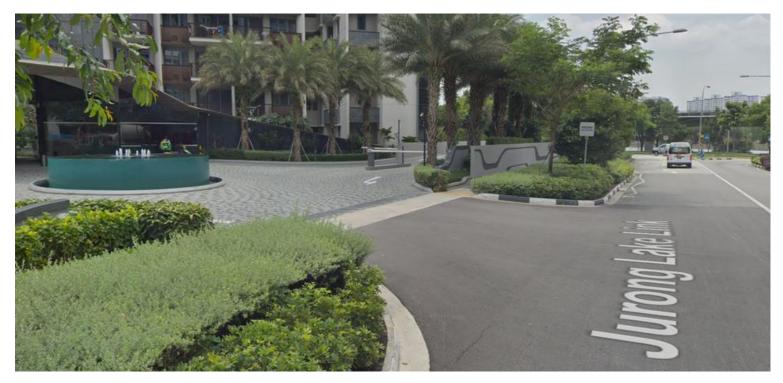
Access of a Residential Drop-Off point located at least 30m from a road junction
